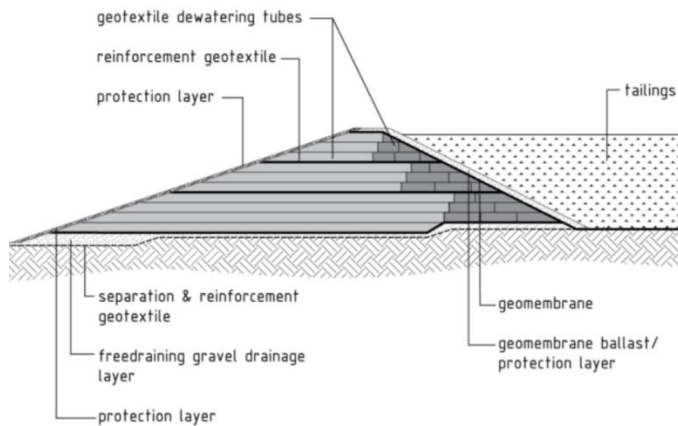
Concept layout of a downstream starter dam using geotextile tubes and geotextile reinforcement (if required to ensure stability)
